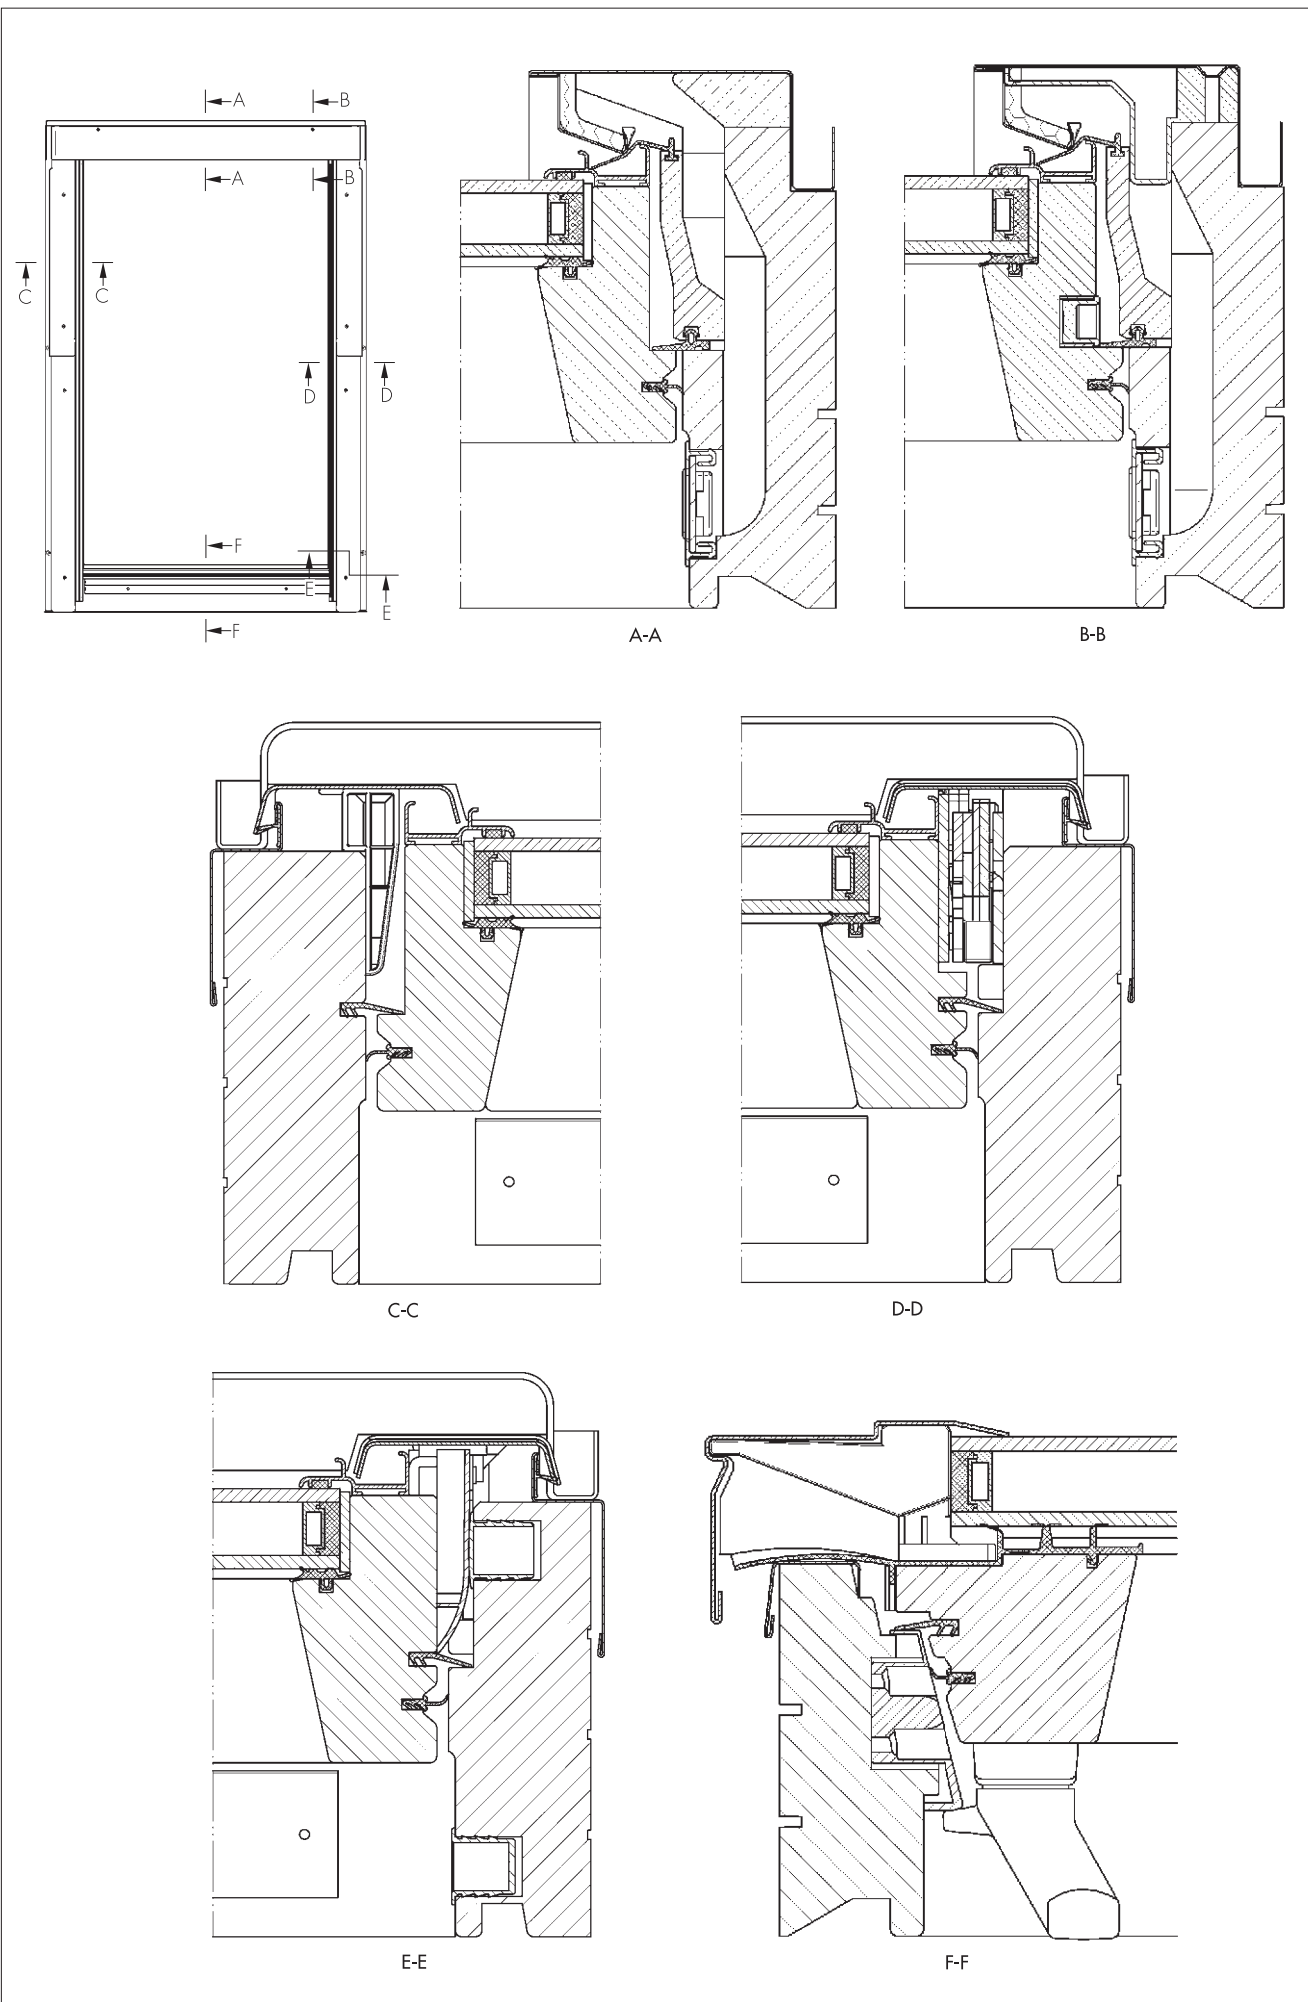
FTL-V Centre Pivot Roof Window cross-sections
